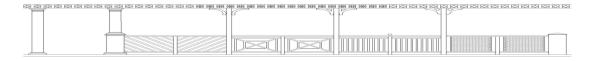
Acceptable Verandah Design, illustrating examples of balustrades, columns, posts and decorative beams
